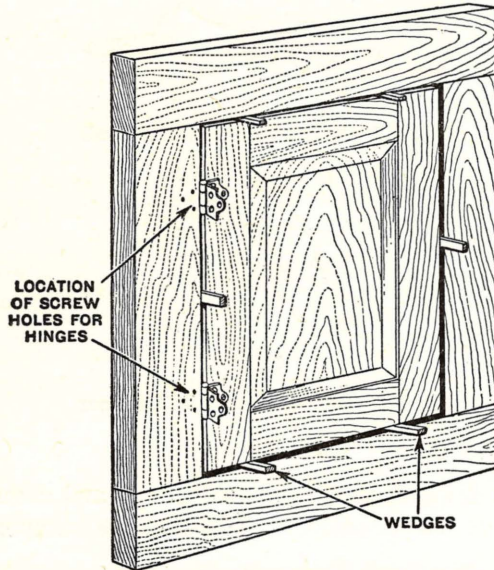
A door should be held in place with wedges while the locations of the screw holes are marked
